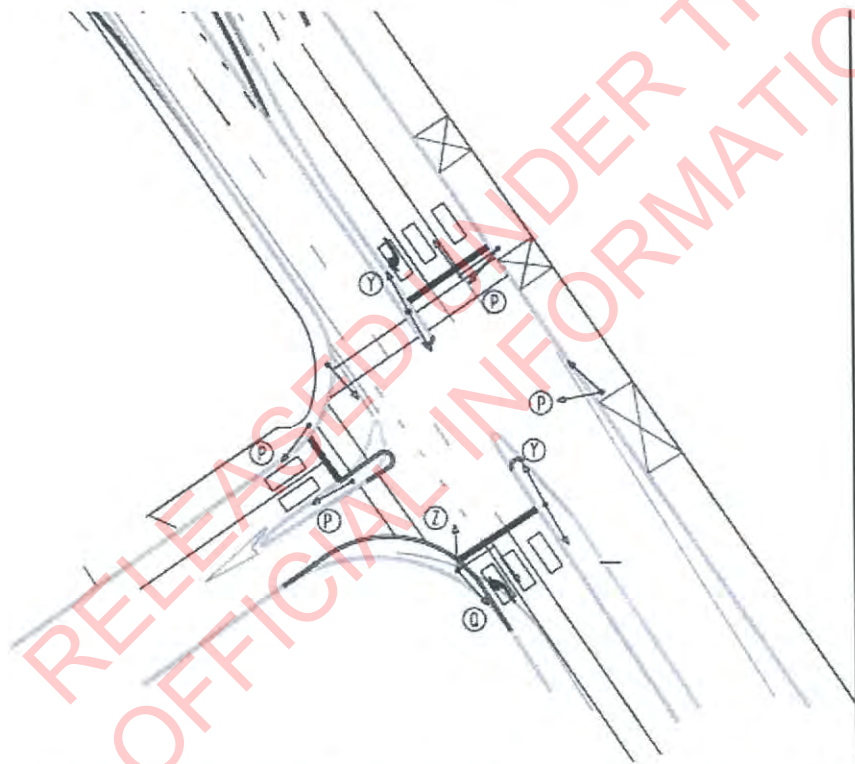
Proposed Signalisation Layout for McCracken Avenue Intersection
